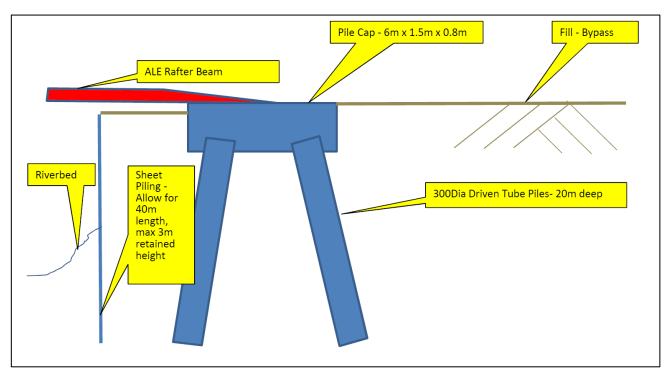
Conceptual illustration of rafters and piles to support the bridge crossings
